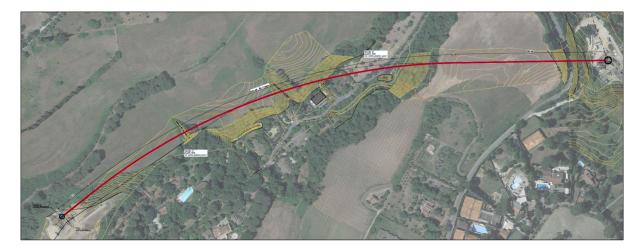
Orthophoto of the section D-I with curvilinear planimetric development
